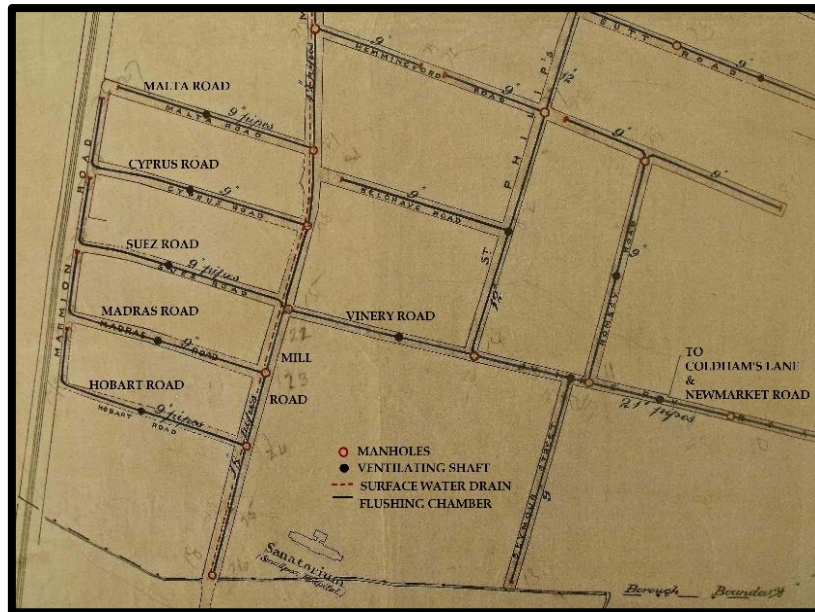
detail of Cambridge Sewerage Contract No. 3 (CA CB/2/SE/1/Roll 91/1)
